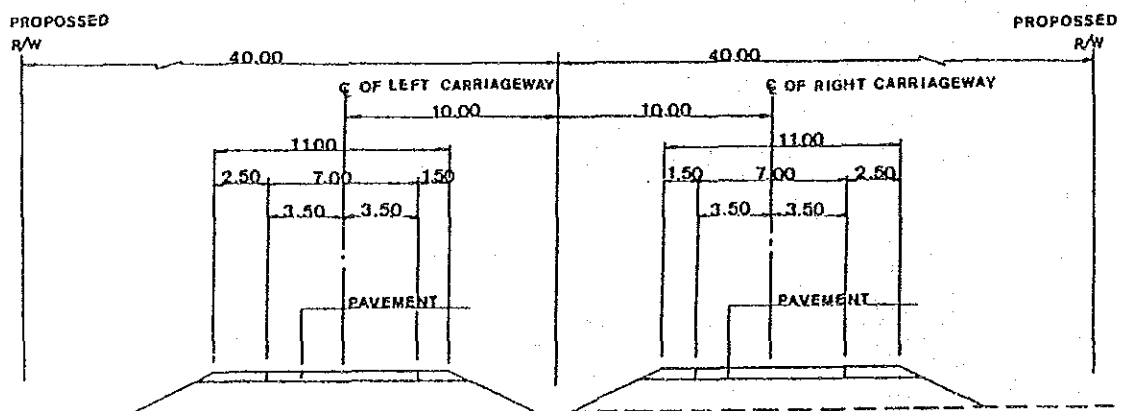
TYPICAL CROSS SECTION OF DIVIDED PRIMARY HIGHWAY
